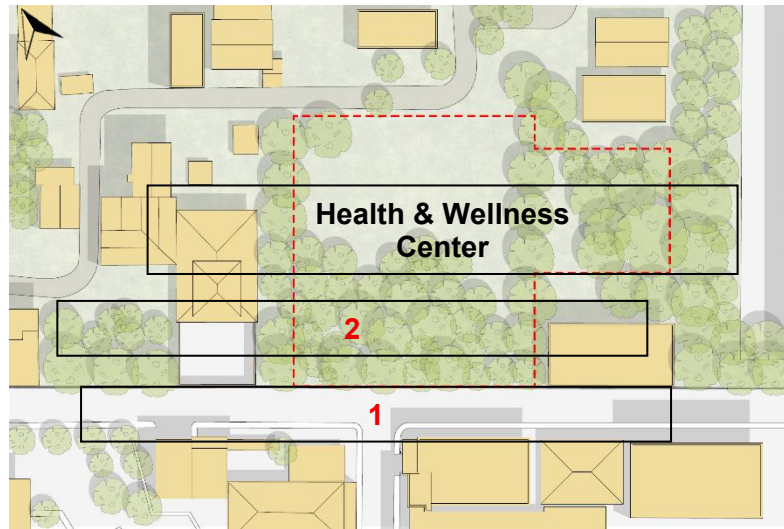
Existing Site Plan with Key for Site Images (Source: drawn by author)
